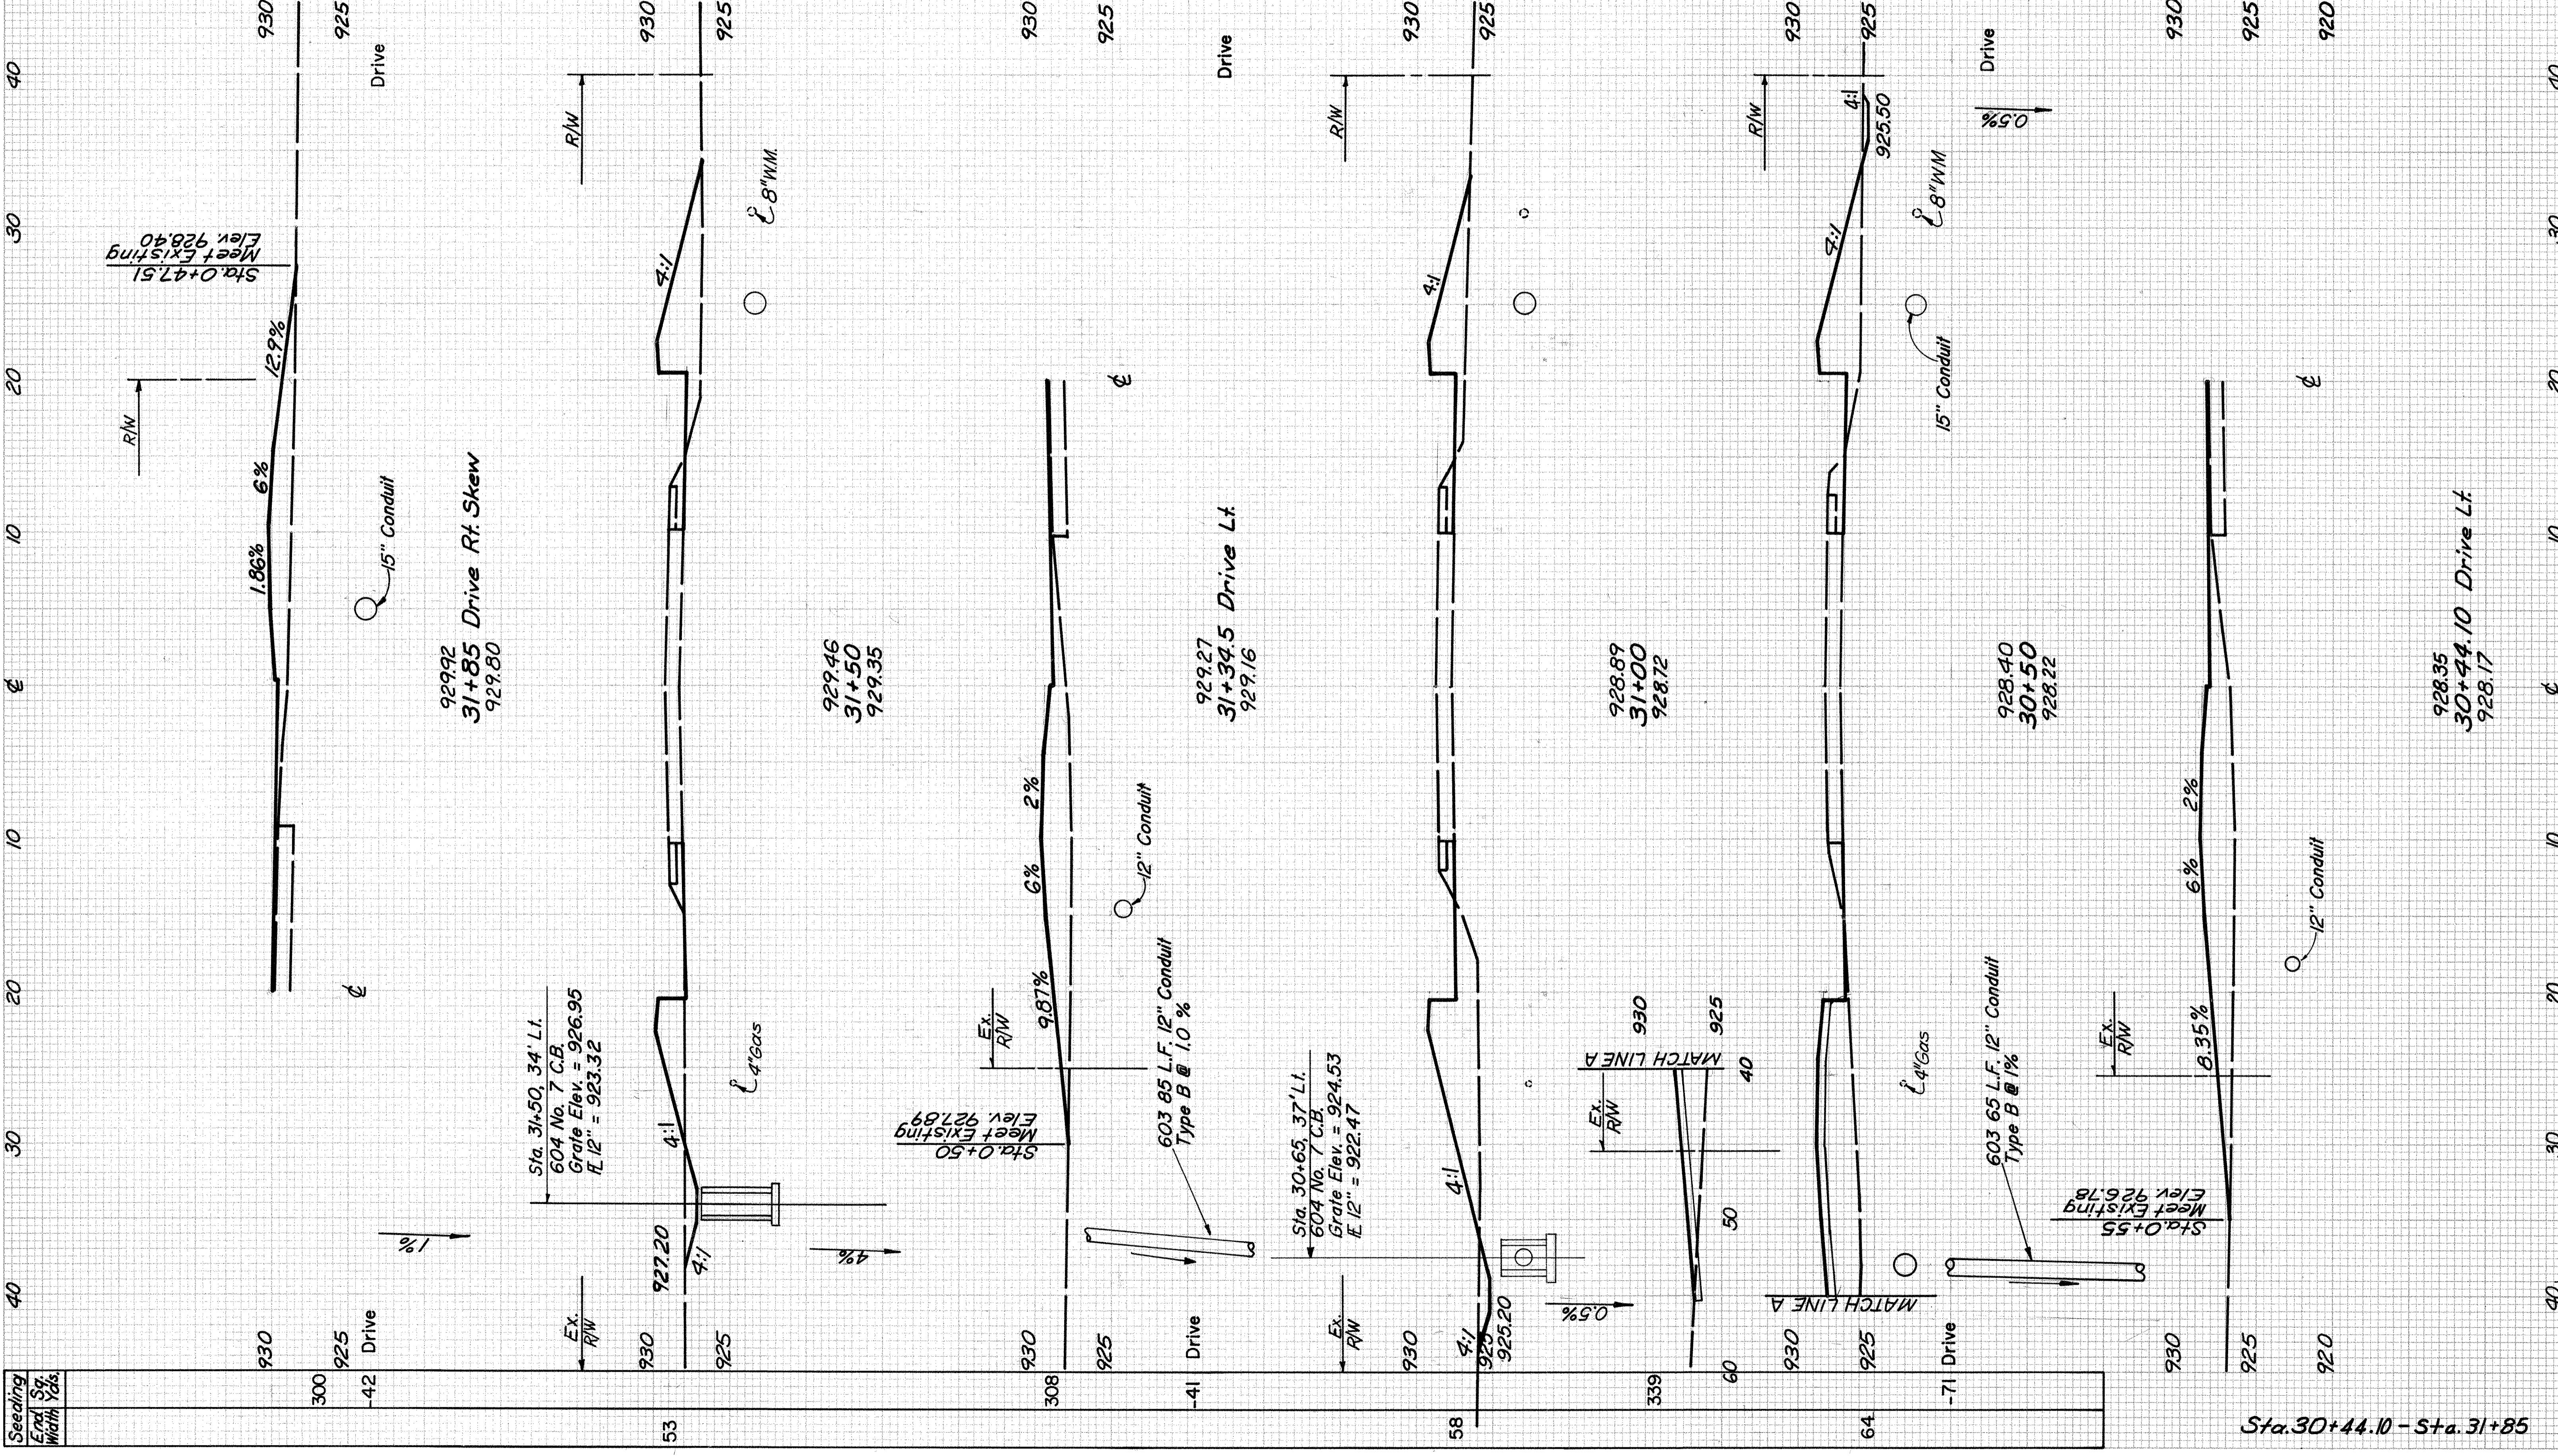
CROSS SECTION O.P.R. & R.E. STANDARD
